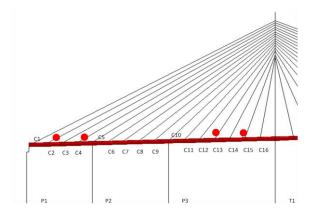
Schematic elevation of the analyzed cable-stayed bridge
